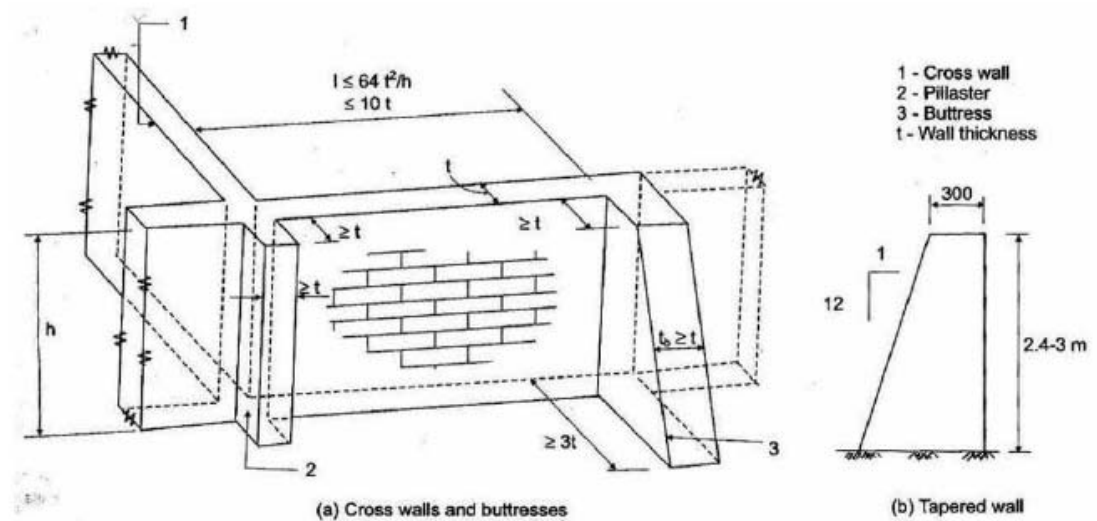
Guidelines for wall construction with buttresses and pilasters (source: IAEE 1986)
